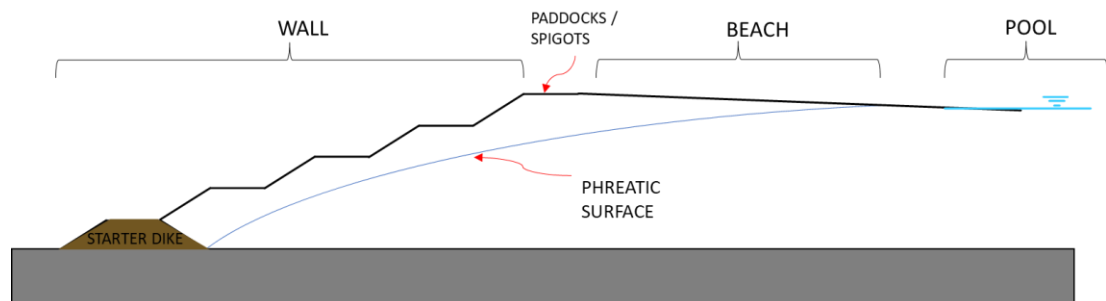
Cross-section of an idealised upstream tailings dam.
